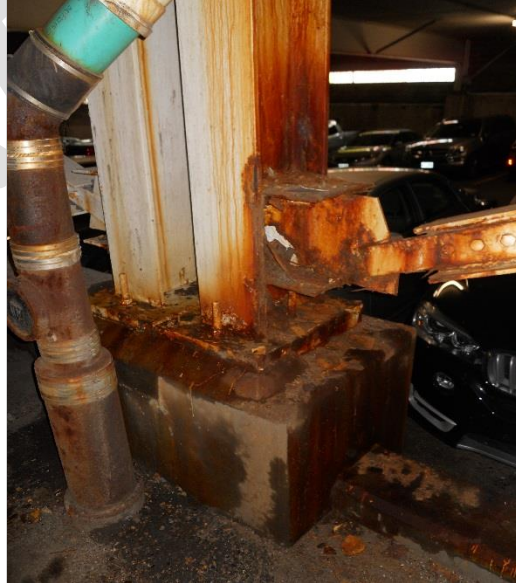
Level 2 Floor slab deterioration and severe corrosion on structural framing.
